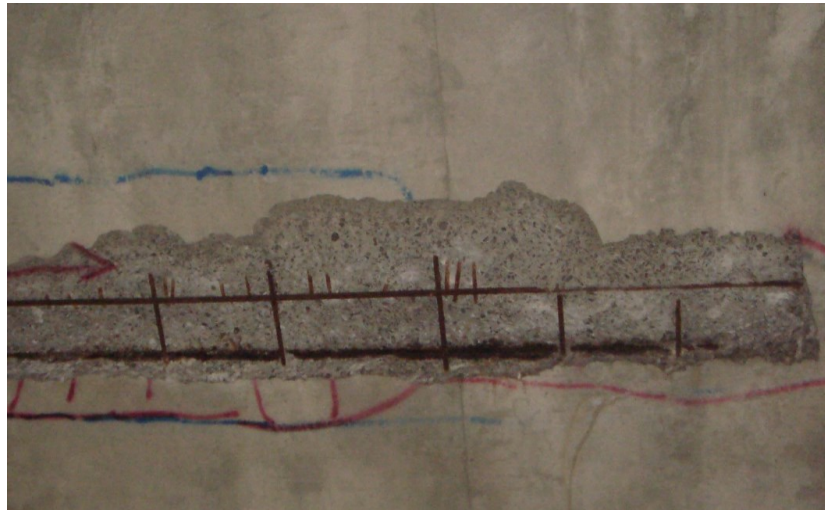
Spalled Defects in a Reinforced Concrete Structures with exposed reinforcement in a bridge in Montreal, Quebec
